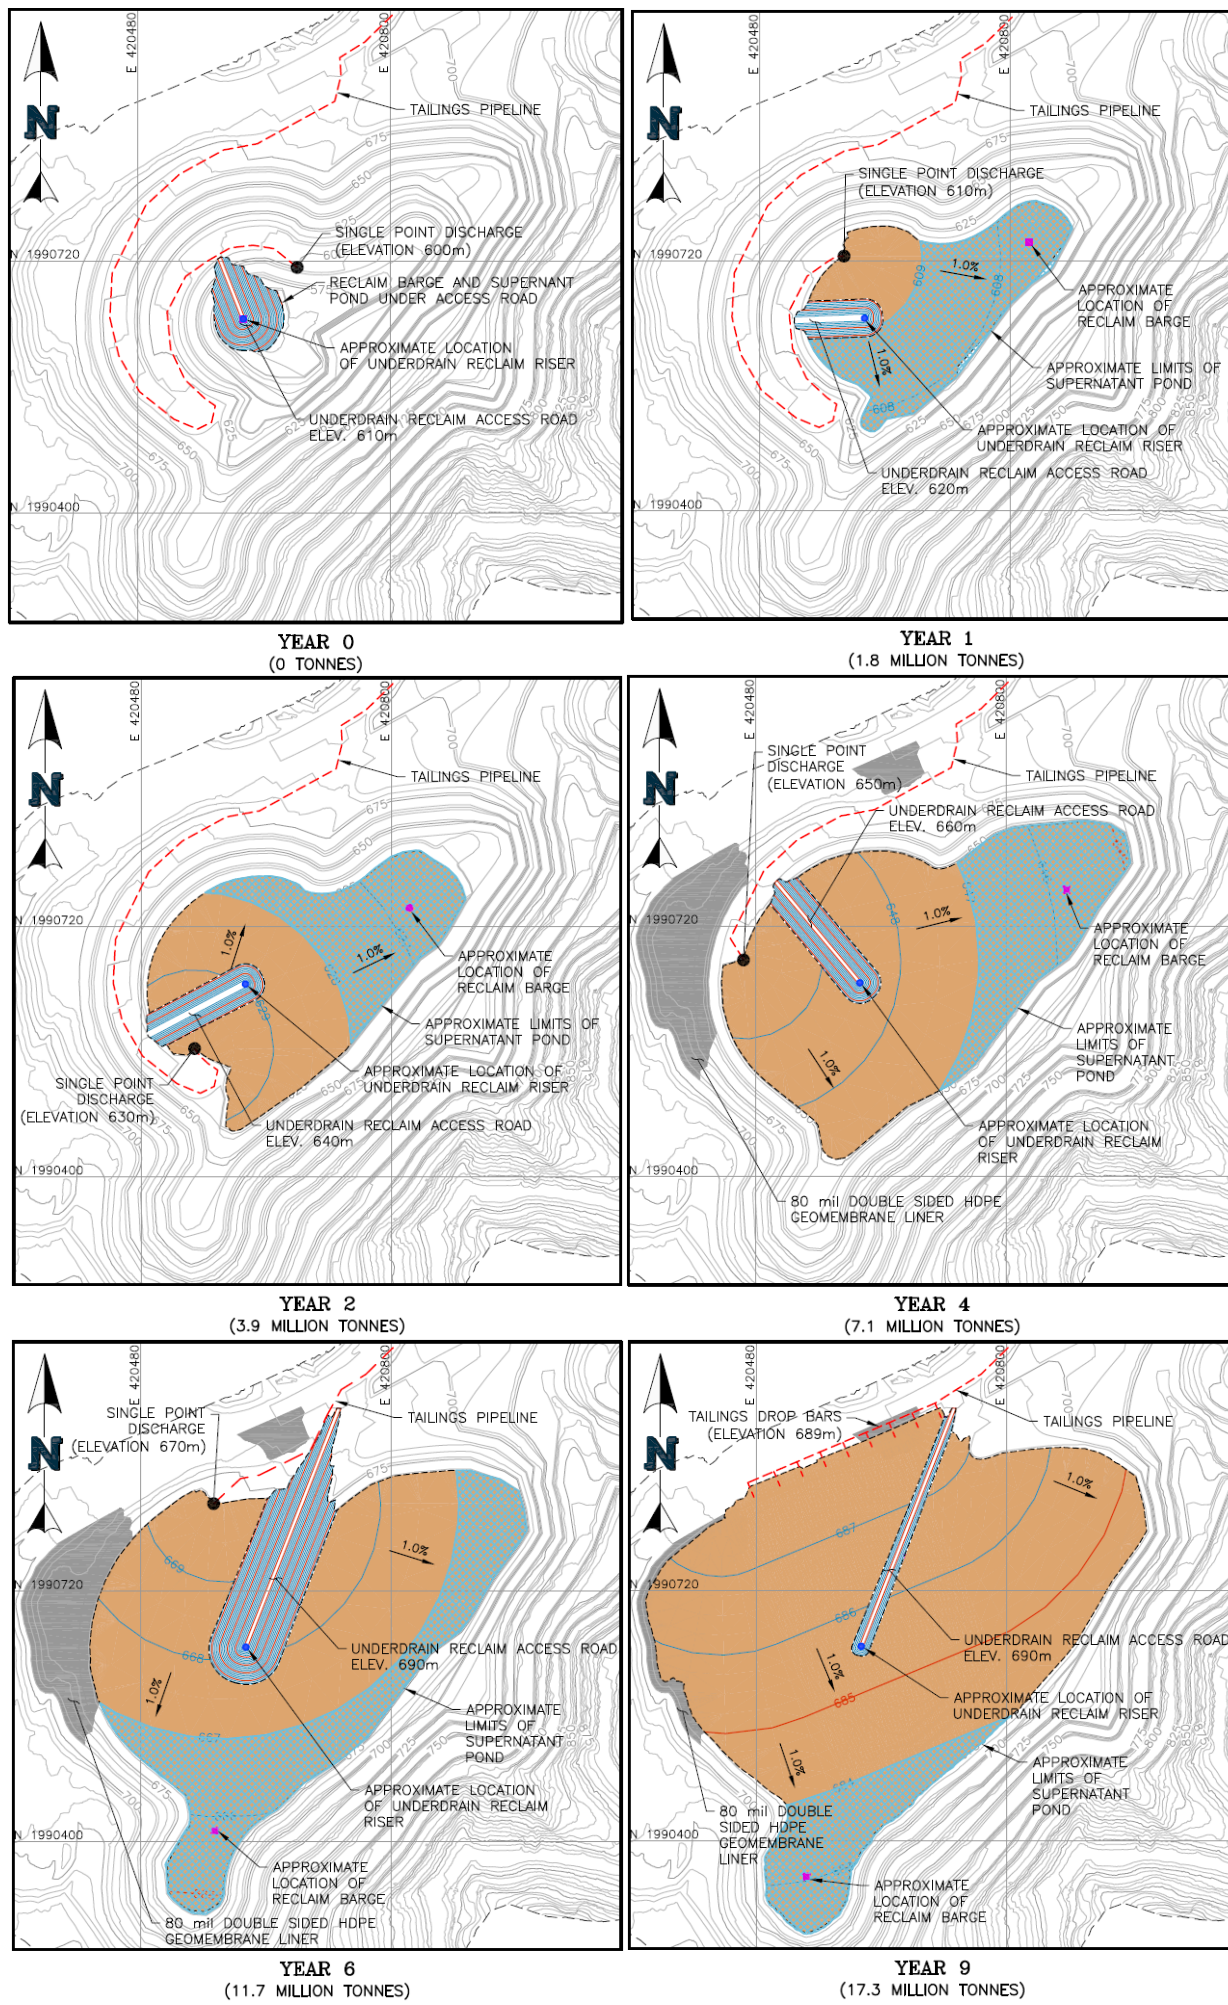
Guajes Pit Tailings Storage Facility Filling Time Steps
